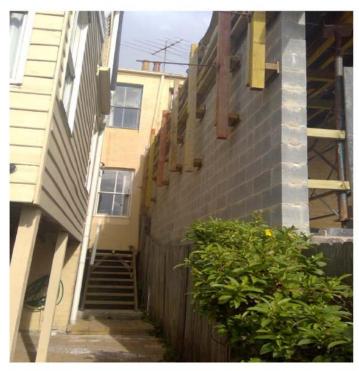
location of proposed deck between No.3 (on lefthand side of photo) and No.1 Wells Street.
